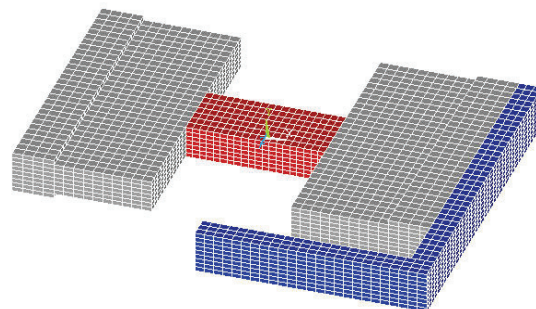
Coupling beam strengthened with FRP wrap (FW)
